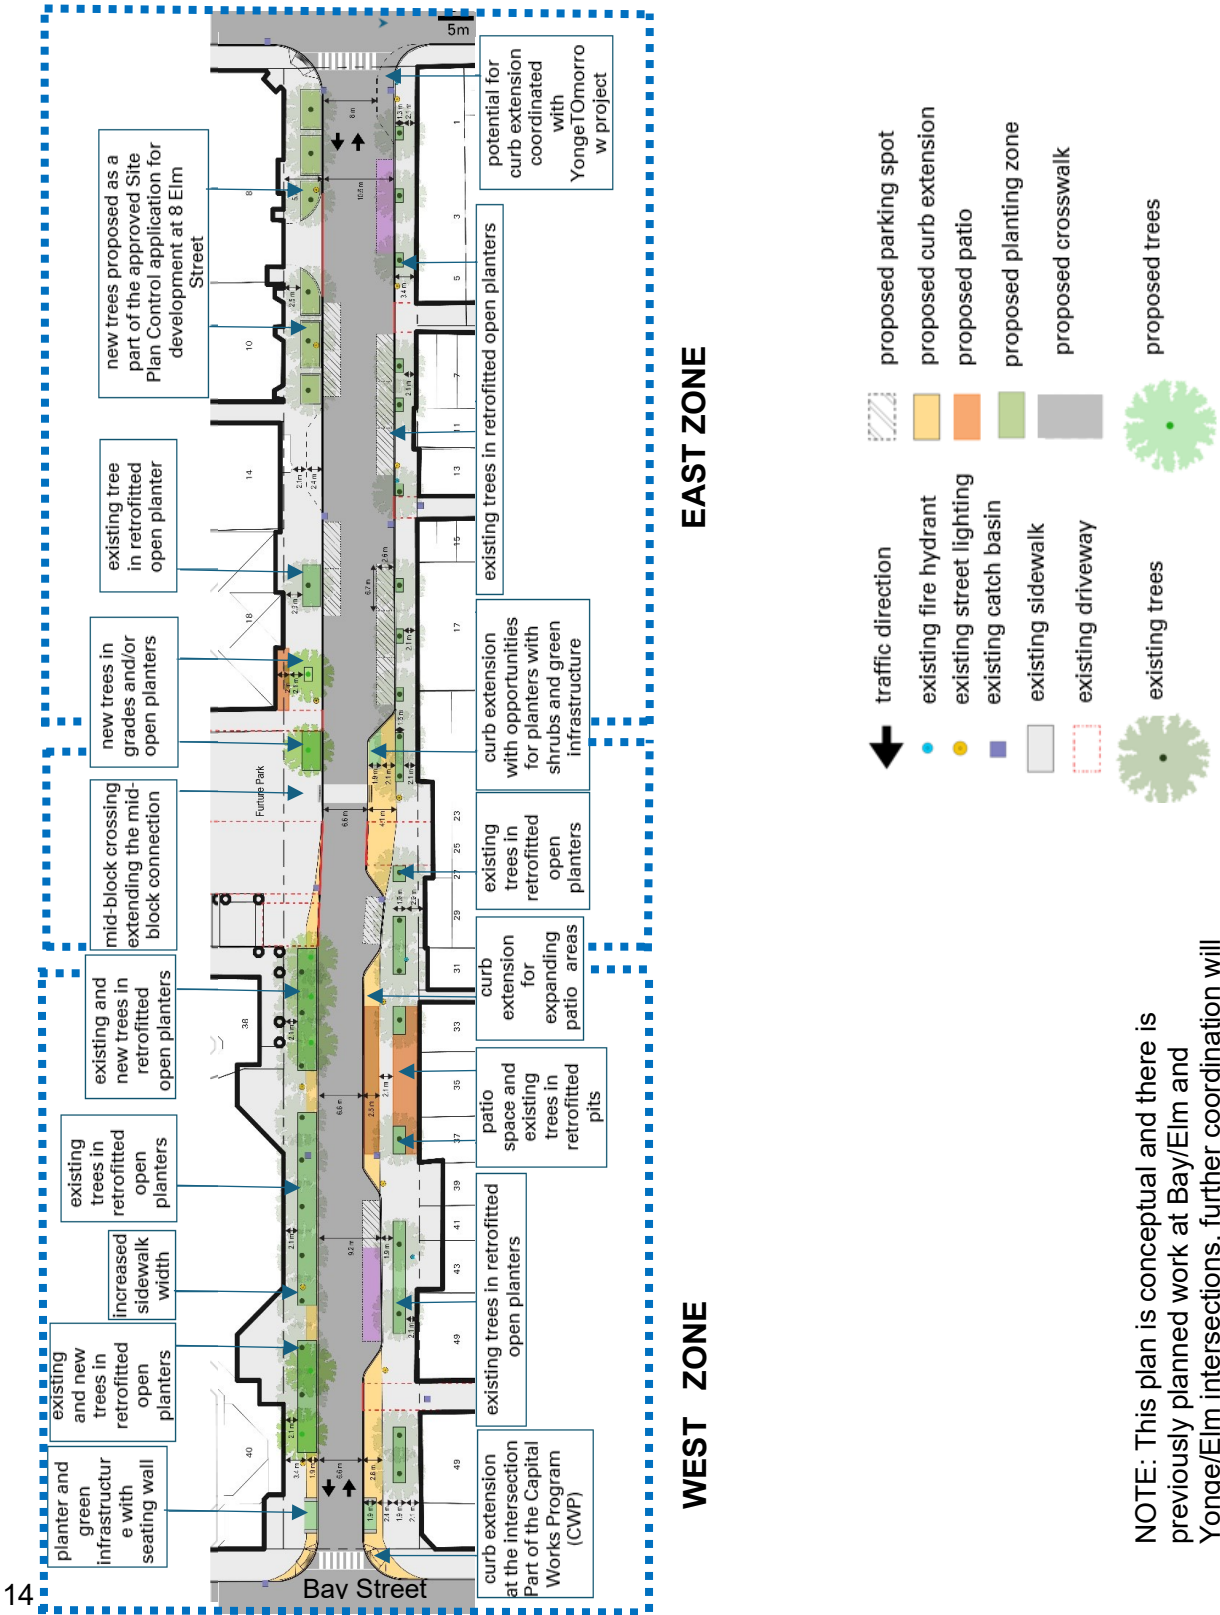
Elm Street Streetscape Masterplan for the Vision – design concept.
